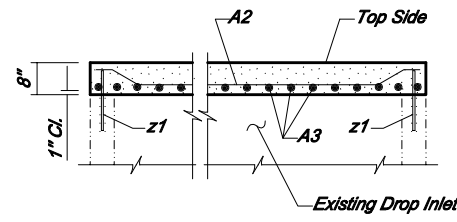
DROP INLET-CONCRETE-PERMANENT COVERS-2
